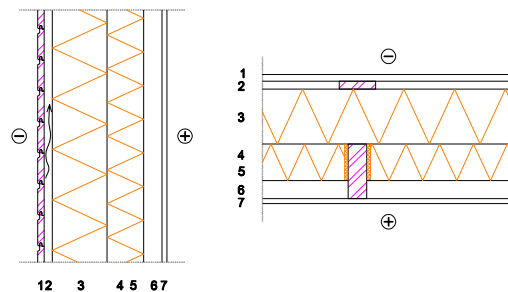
ZEB wall composition: 1 – gel coating; 2 – ventilated gap; 3 – slab SPU AL 150 mm; 4 – slab SPU AL 100 mm; 5 – rack wooden frame; 6 – space for laying of engineering communications; 7 – interior finishing layer.
